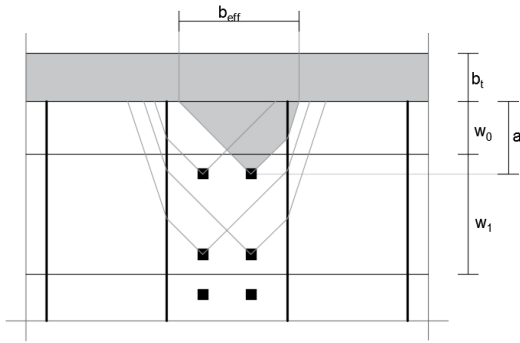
Load distribution towards side girder in load situation 1 for massive floor girders with orthotropic behaviour
